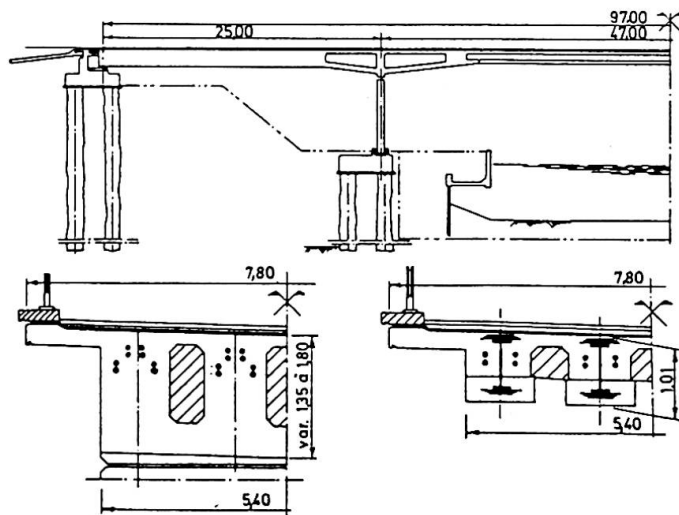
NEW "DEVALLEE" BRIDGE OVER THE RIVER SCHELDT AT TOURNAI
